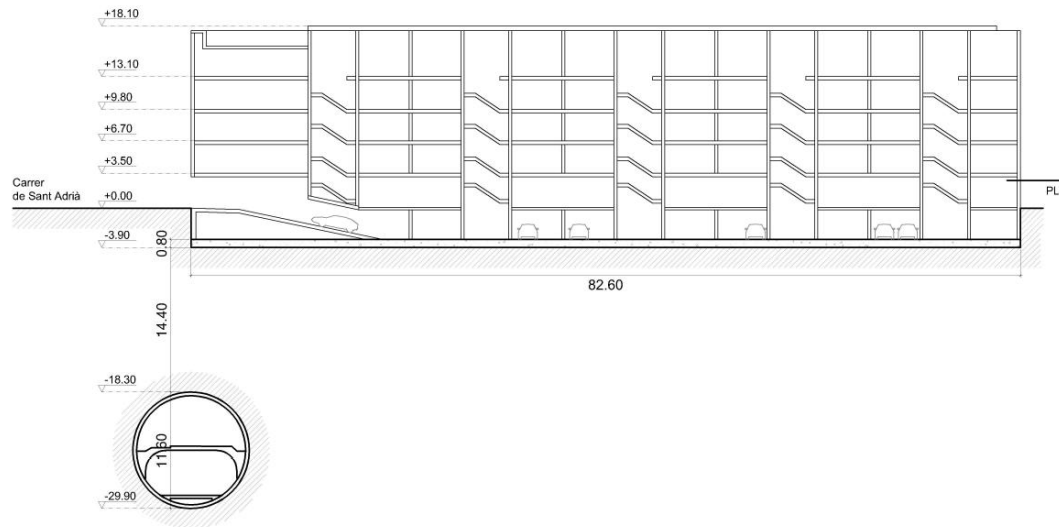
Schematic cross section of L9 tunnel in relation to the building
